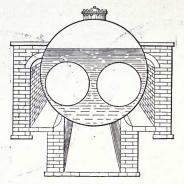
Method of setting Cornish and Lancashire boilers.
